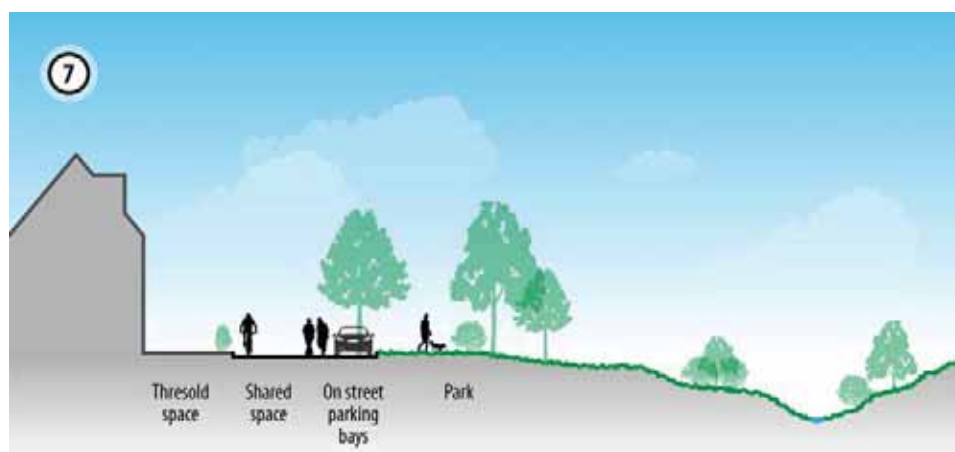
Indicative Street Section 7: Tertiary Street overlooking park.
